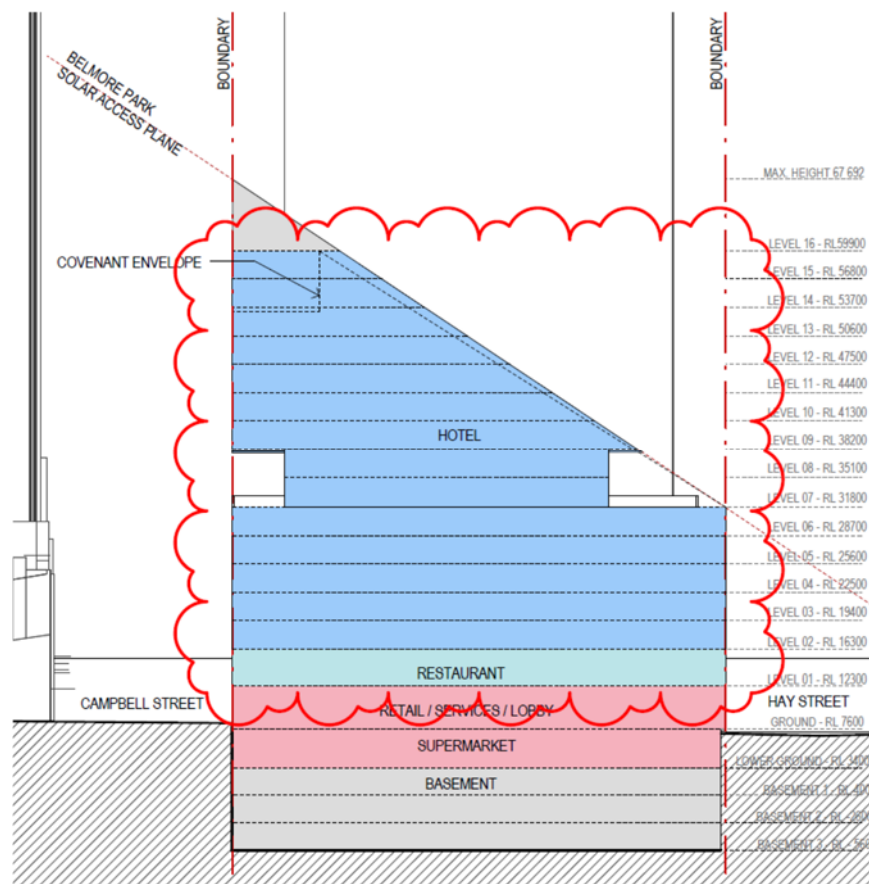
Proposed building envelope showing the Belmore Park sun access plane and the covenant that affects the site.
